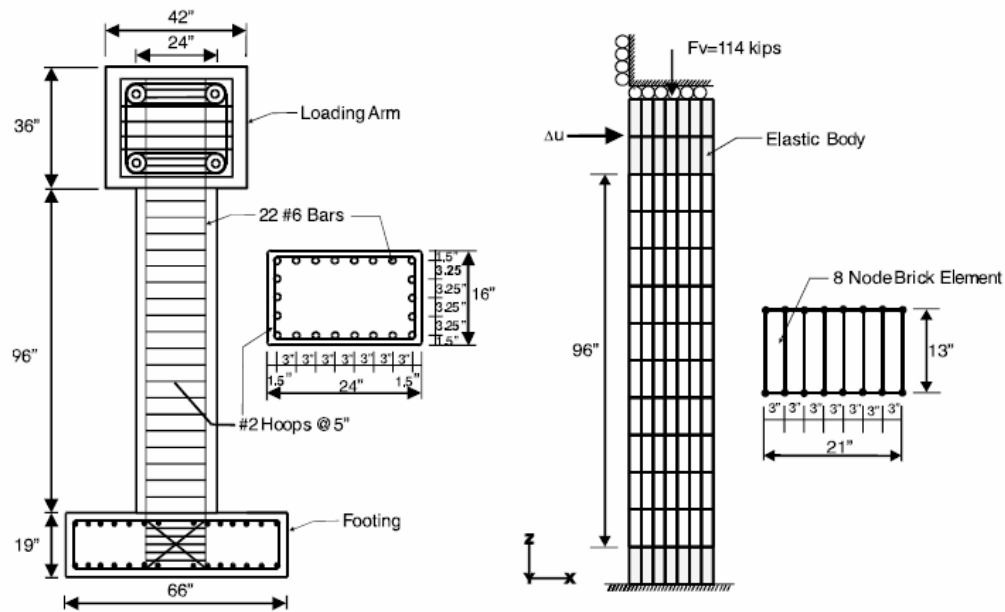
Concrete Column (Balan, Spacone and Kwon 2001)
